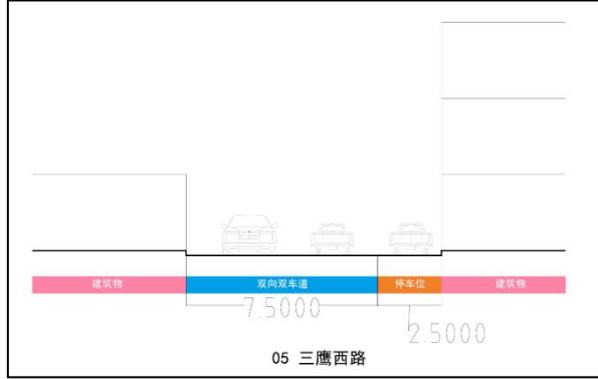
Sanying West Road road section Resource: Self-drawn by the author
